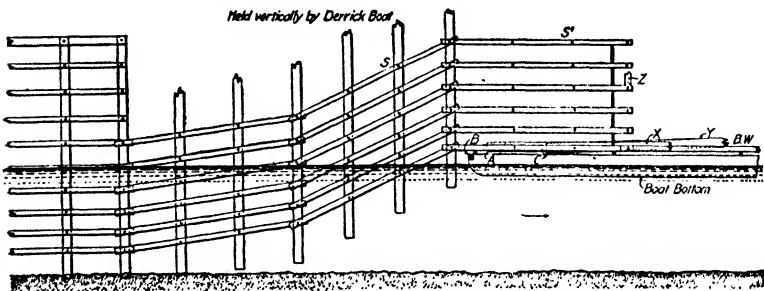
Method of Constructing Ohio River Cofferdam.
